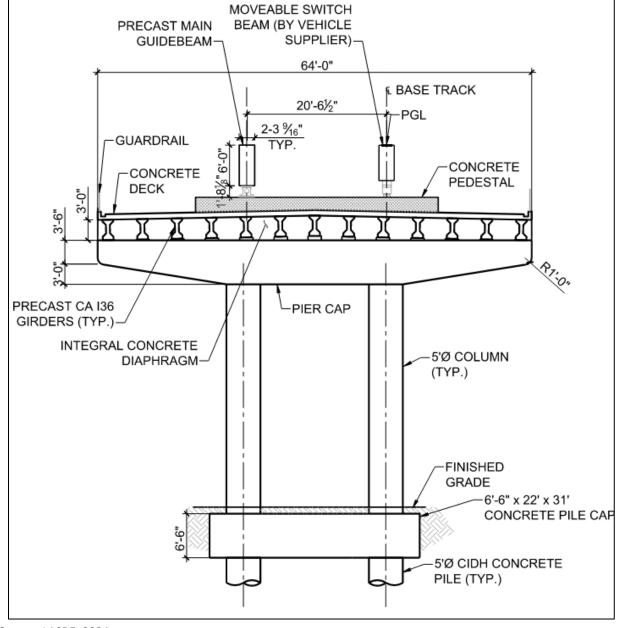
Typical Monorail Beam Switch Cross-Section
